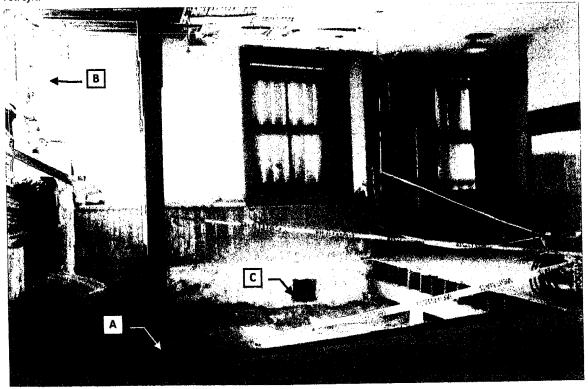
Room 3 view south. (A) Section of floor has been removed, (B) East exterior wall is missing, (C) Downspout drain.
